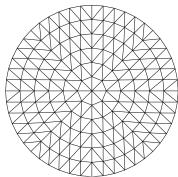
The Upper Chord Struts Layout Fig. 5 The Lower Chord Cables and Struts Layout
